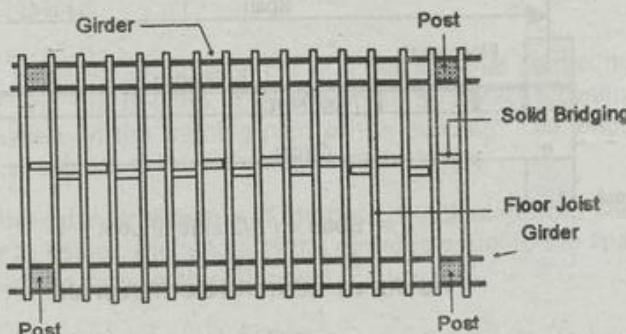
FLOOR JOIST AND T & G FLOORING
